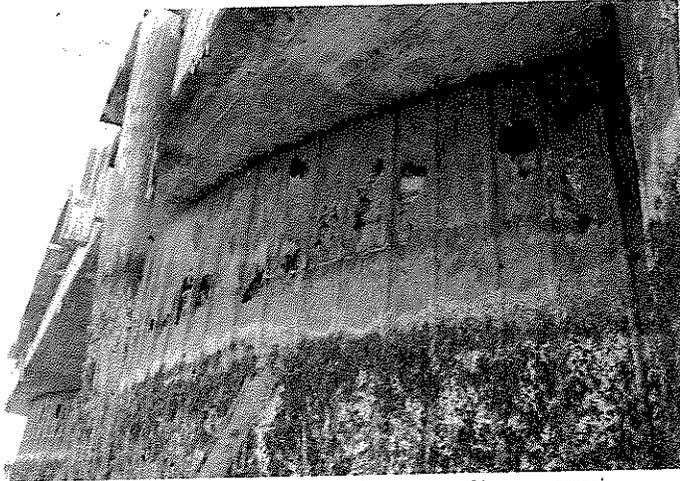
Mitchell Field North Pier Cell collapsed (front view)
